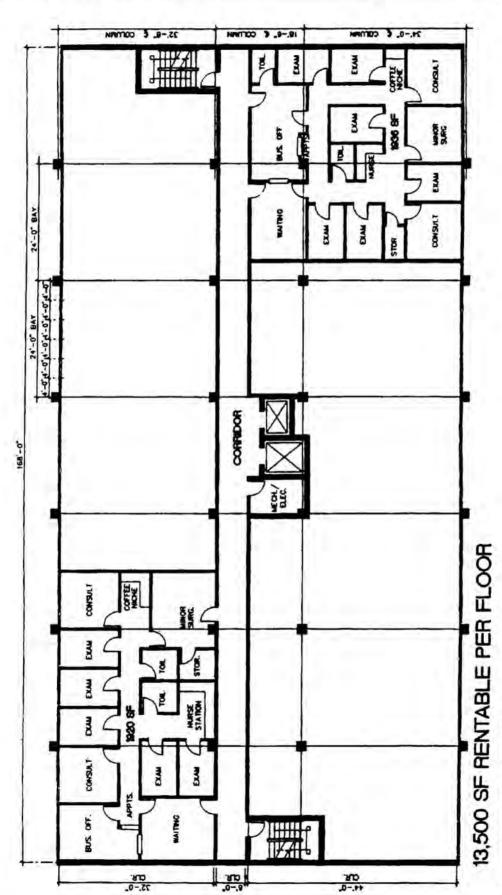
Floor plan, building shell. (Design: Jain Malldn Inc.)
